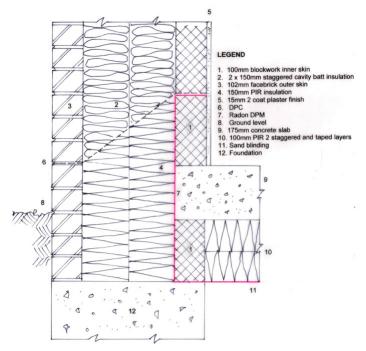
Ground floor to external wall junction. Drawing by Lacey Interior Architecture Ltd.
